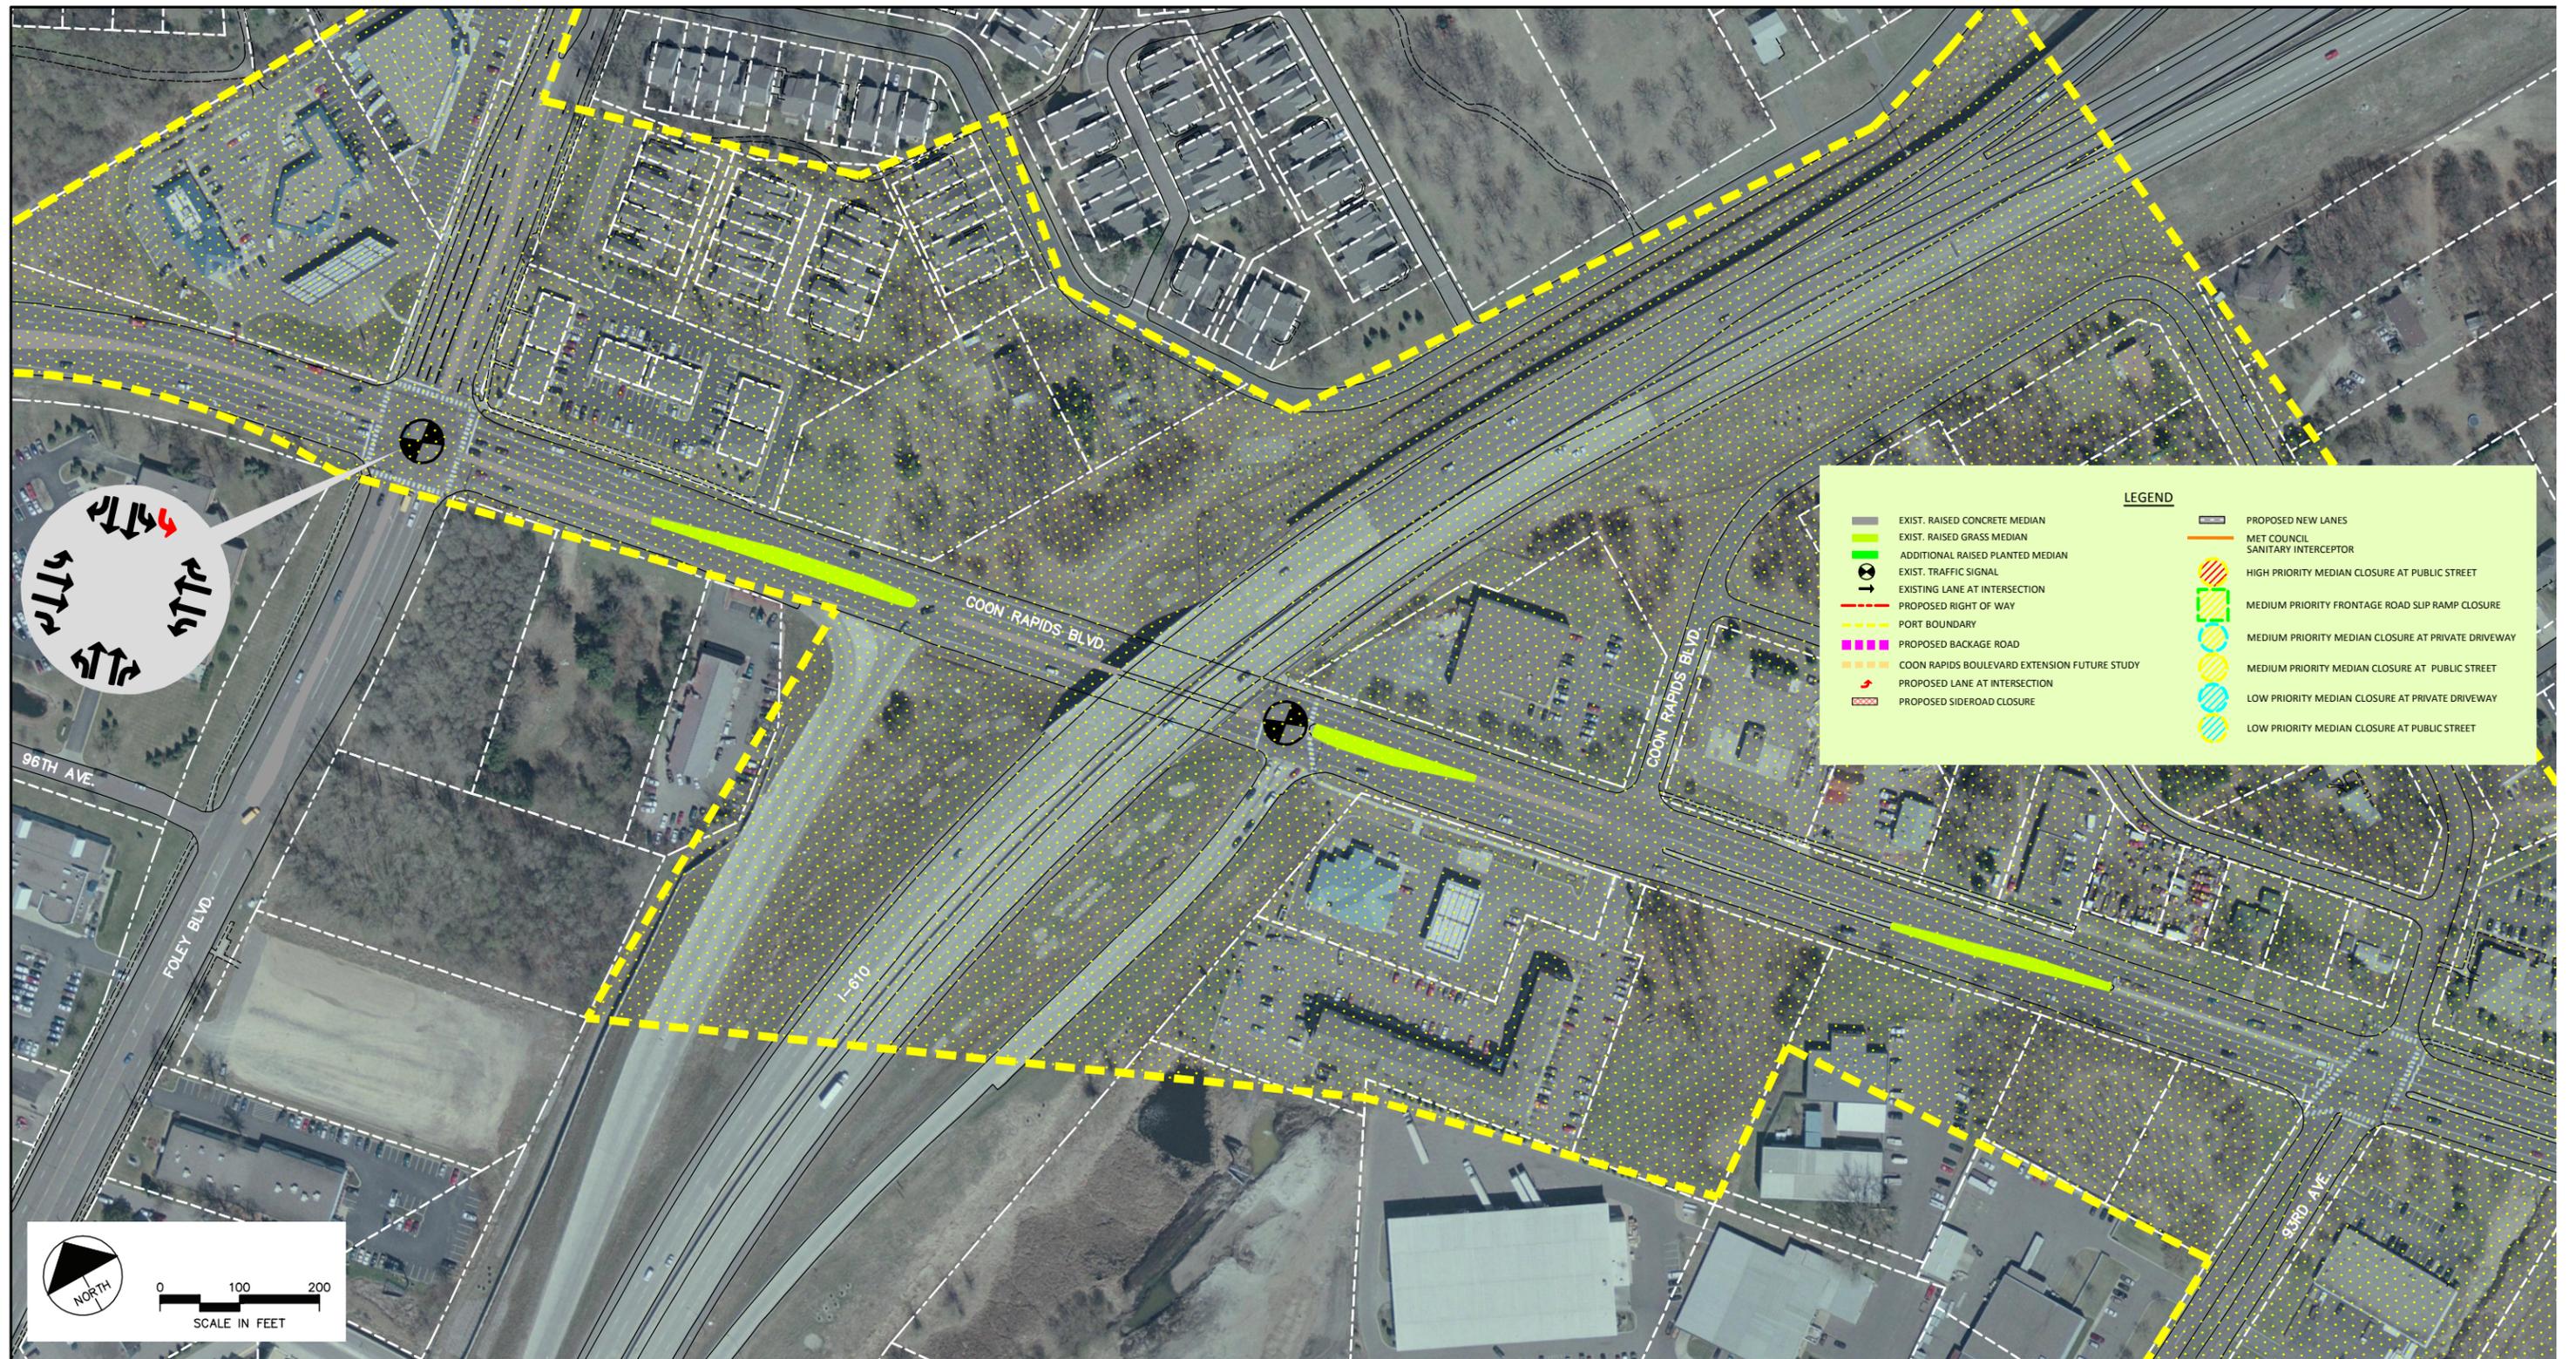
Proposed Roadway Recommendations Detail (13 of 15)
